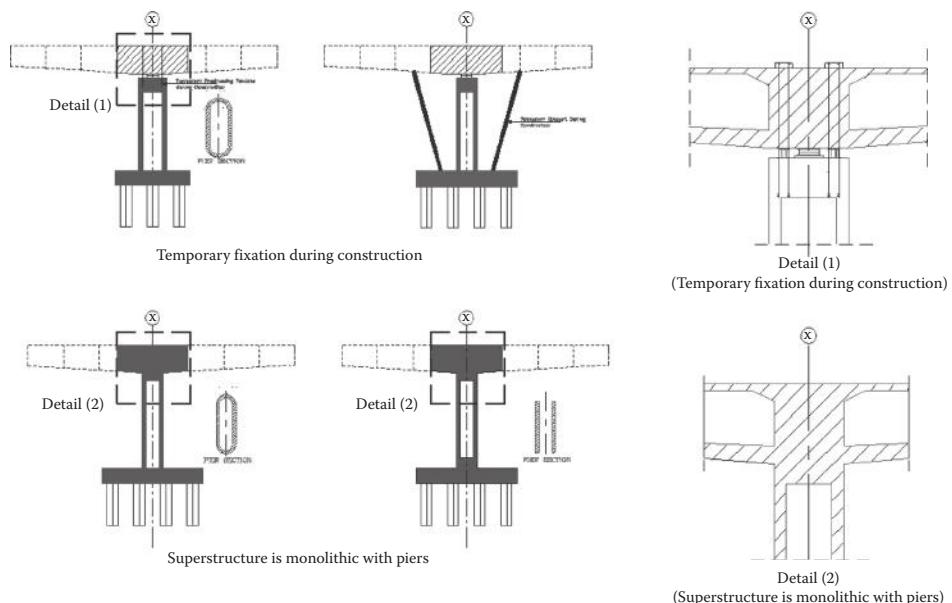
Example of fixation at deck to pier in cantilever bridges.
